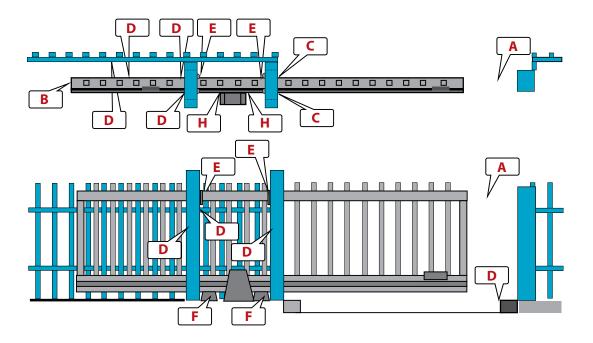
Plan and elevation view of a powered cantilever sliding gate
